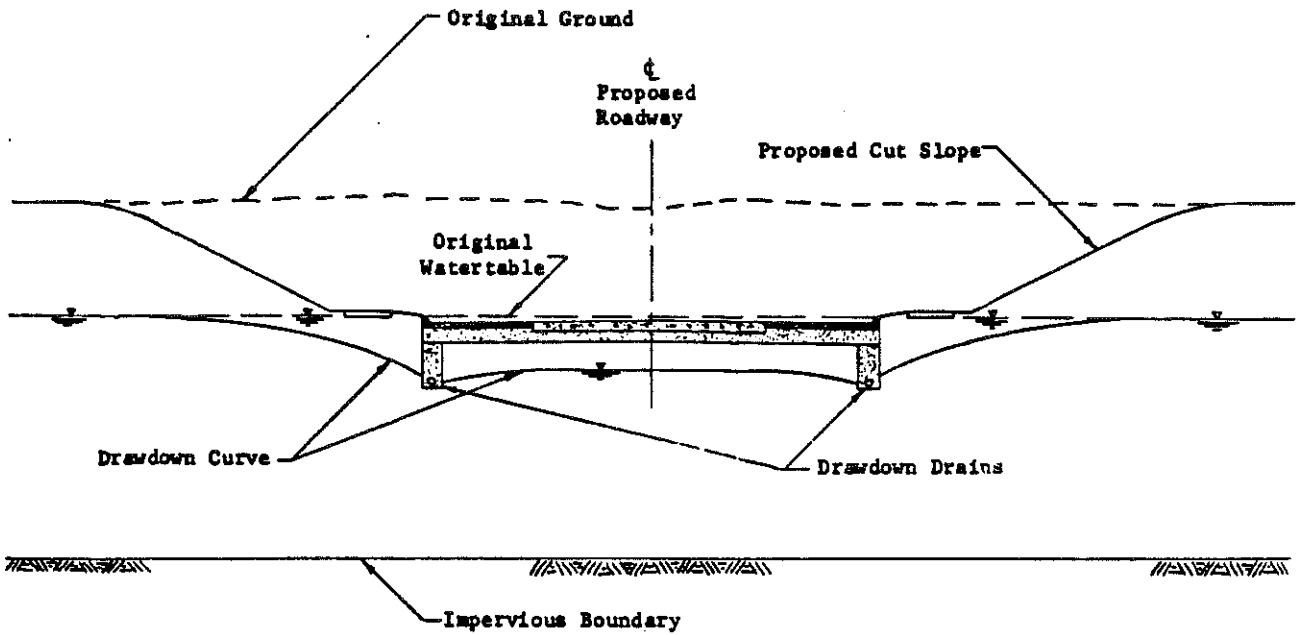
Longitudinal Drains at Each Edge of Pavement Lower Water Table.
